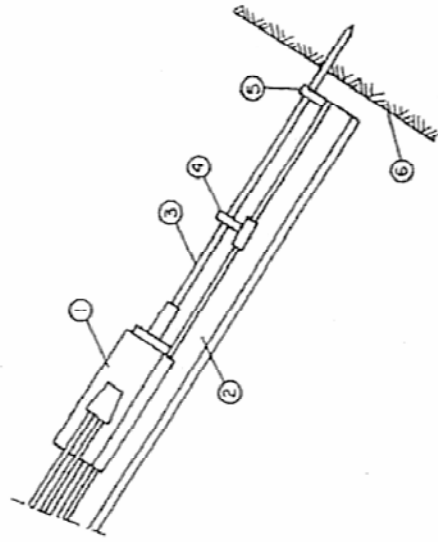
The 'jet bolting' technique for soil installation—combines vibropercussion and high grout pressure at the nail tip.<sup>49</sup> ① = Vibropercussion hammer; ② = sliding support; ③ = reinforcement to be inserted; ④ = sliding guide; ⑤ = fixed guide; ⑥ = soil to be treated.
